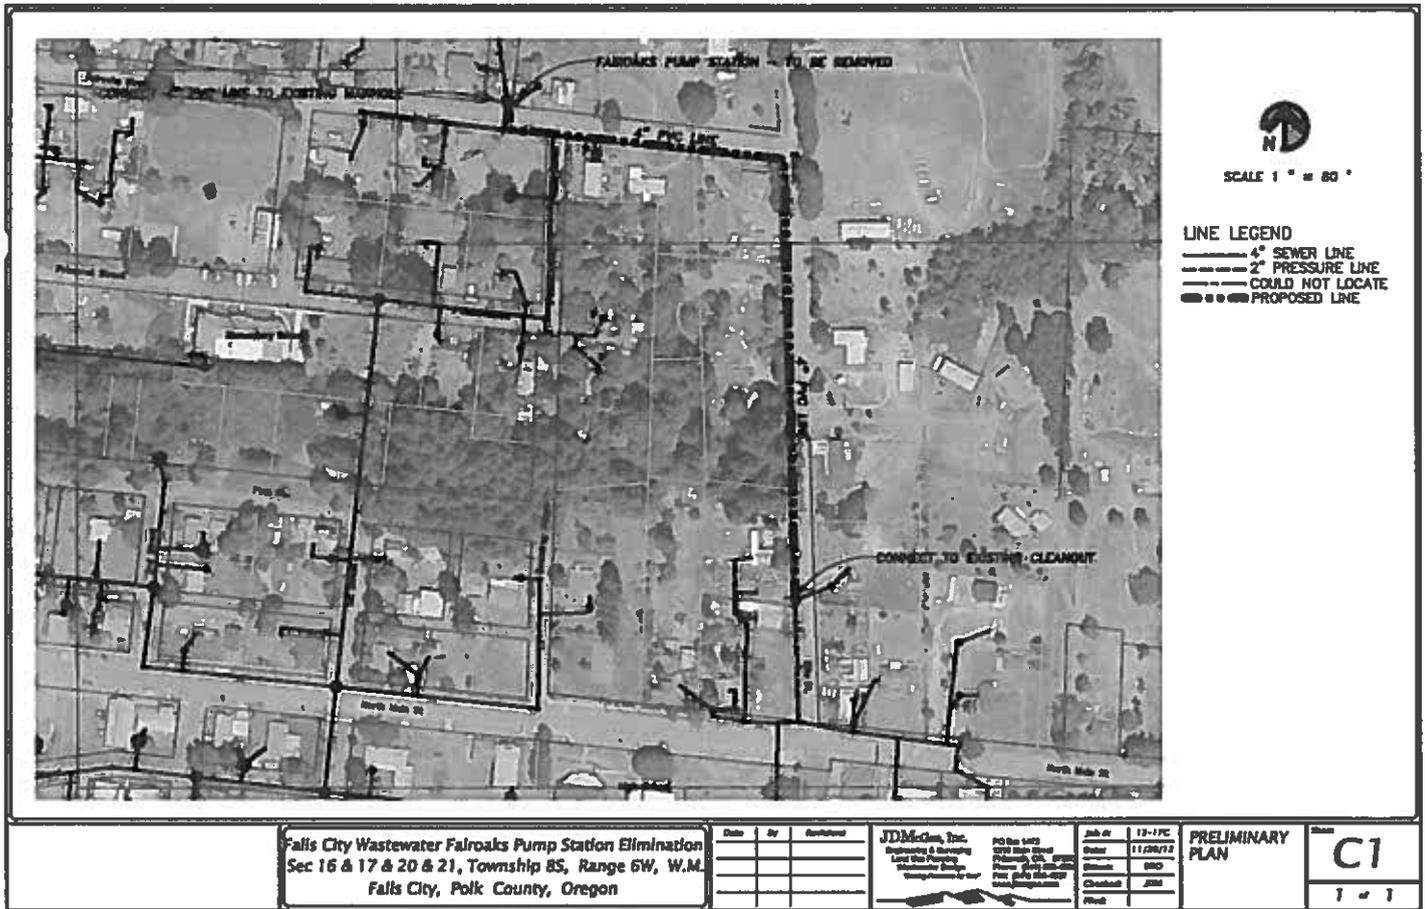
Preliminary Fairoaks Pump Station Plan
